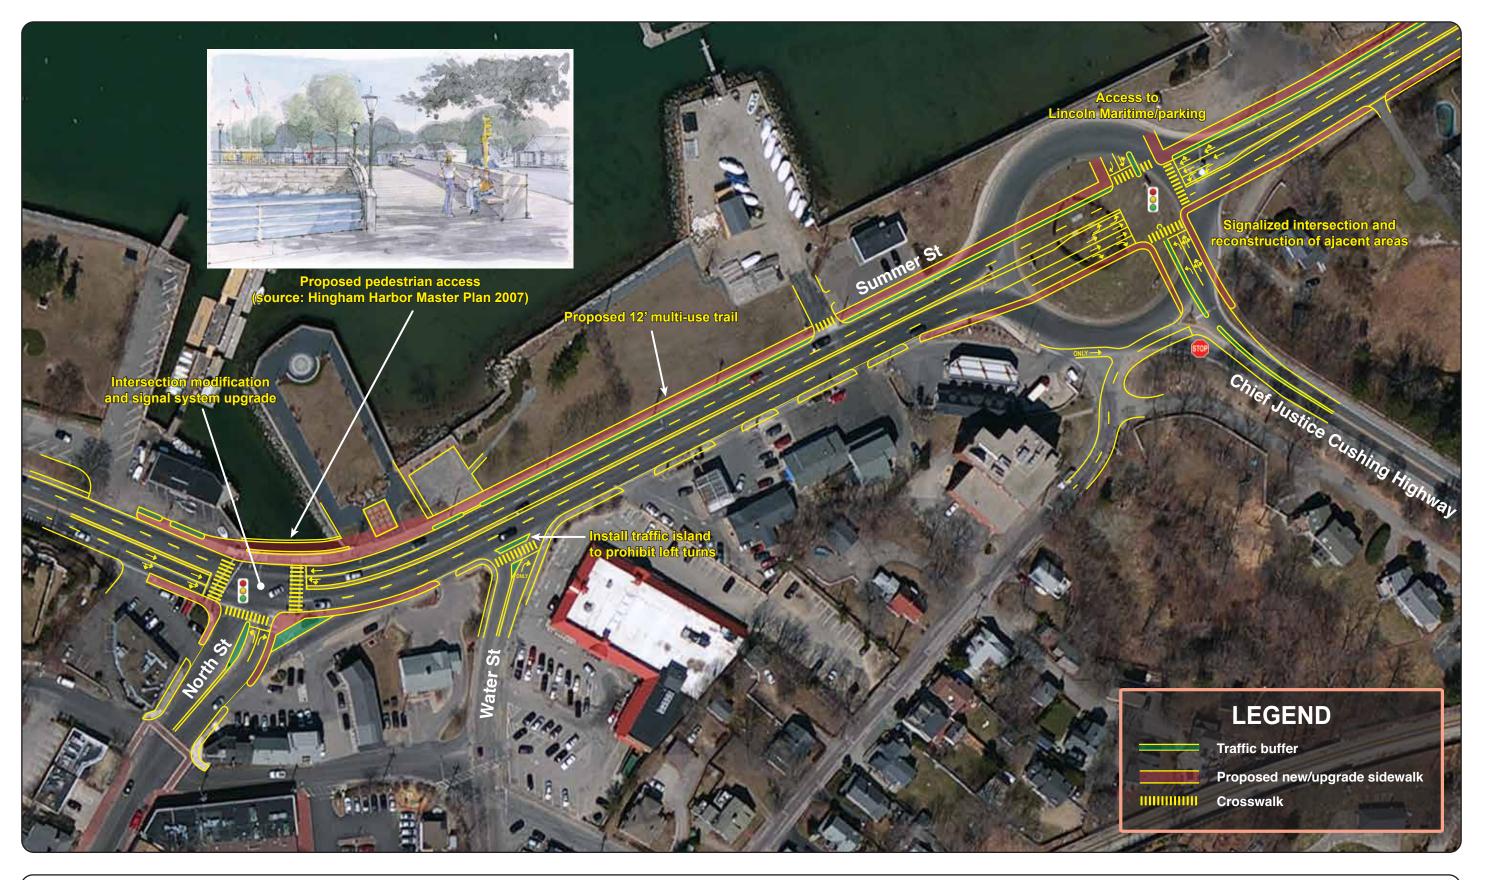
Proposed Long-Term Improvement Conceptual Plan: Summer Street in the Harbor Area Summer Street/George Washington Boulevard in Hingham and Hull
